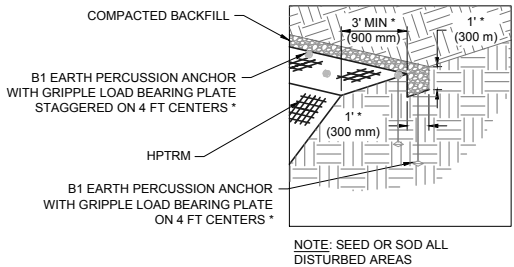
TOP OF BANK (TOB) ANCHOR TRENCH
